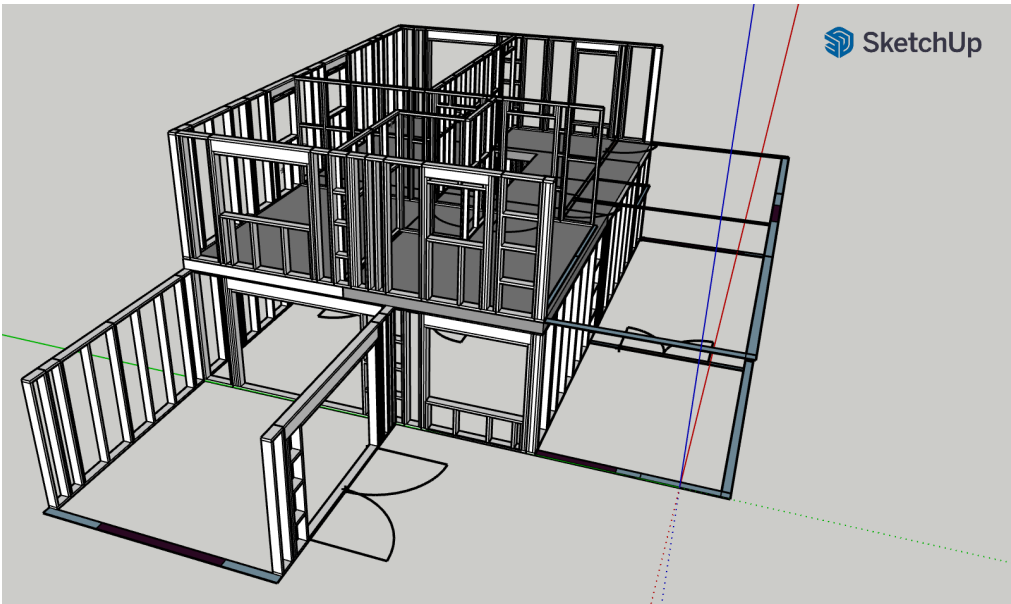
Whole house as smaller version vs. original size seen from the back. Floor layout shows original size. (Cathedral window of garden room and first floor “left” replacement wall not shown.)
